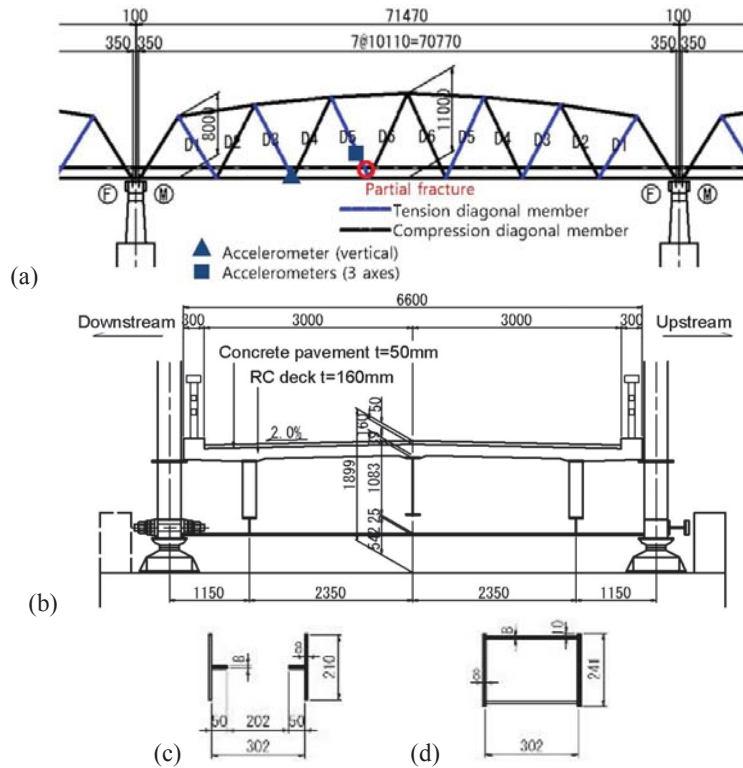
Steel truss bridge investigated: (a) side view of single span (fourth span), (b) cross section of bridge, (c) cross section of tension diagonal member, (d) cross section of compression diagonal member. Unit [mm].
